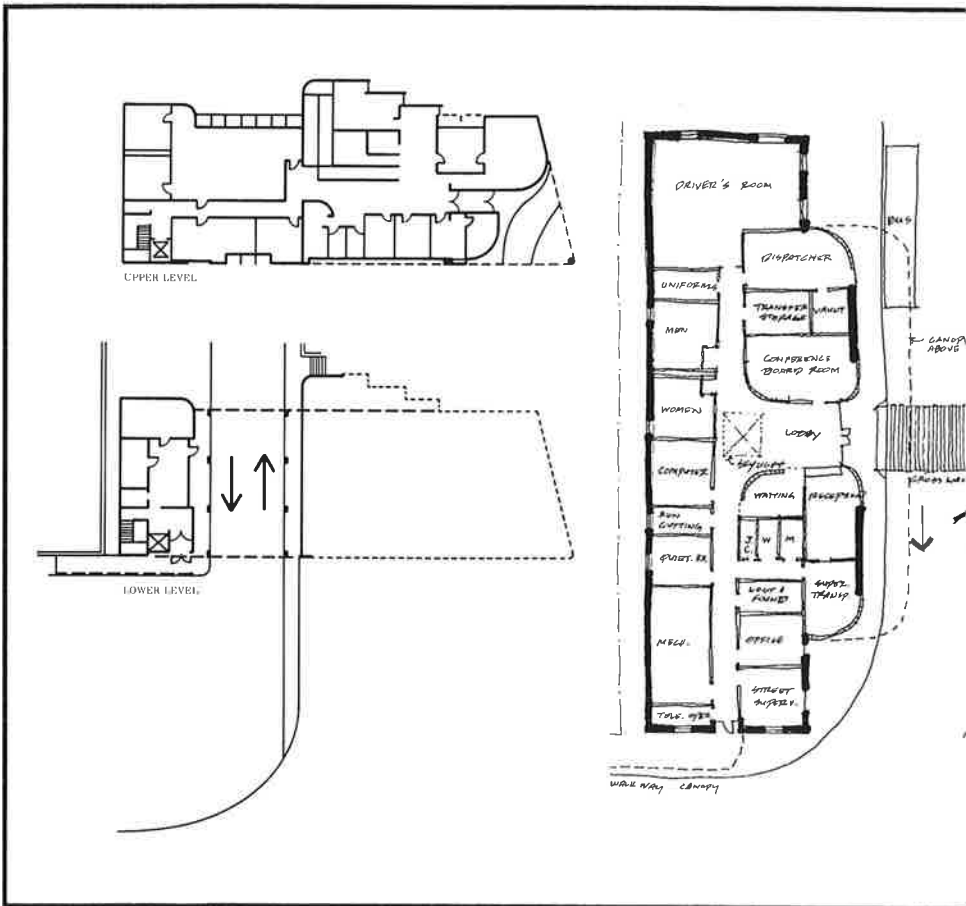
The Original 1-½ Story Operations Building Design Shown at Left Replaced with the Single-level Plan at Right
